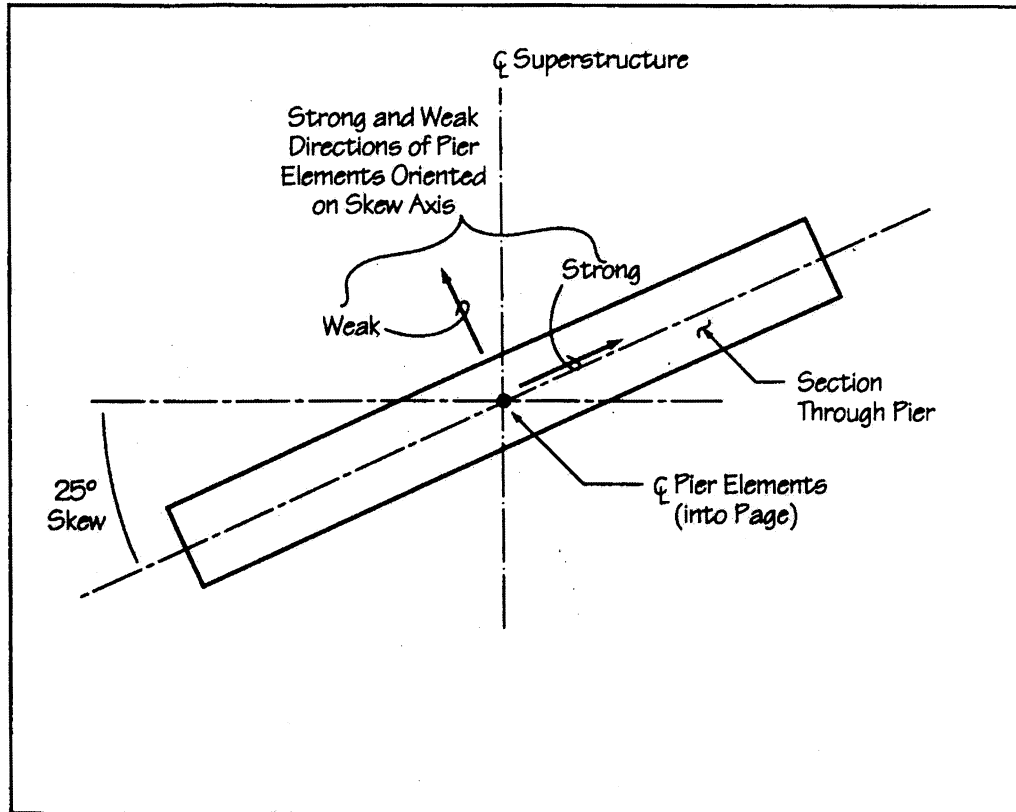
Bridge No. 2 - Plan of Pier Showing Rotation of Pier Elements
